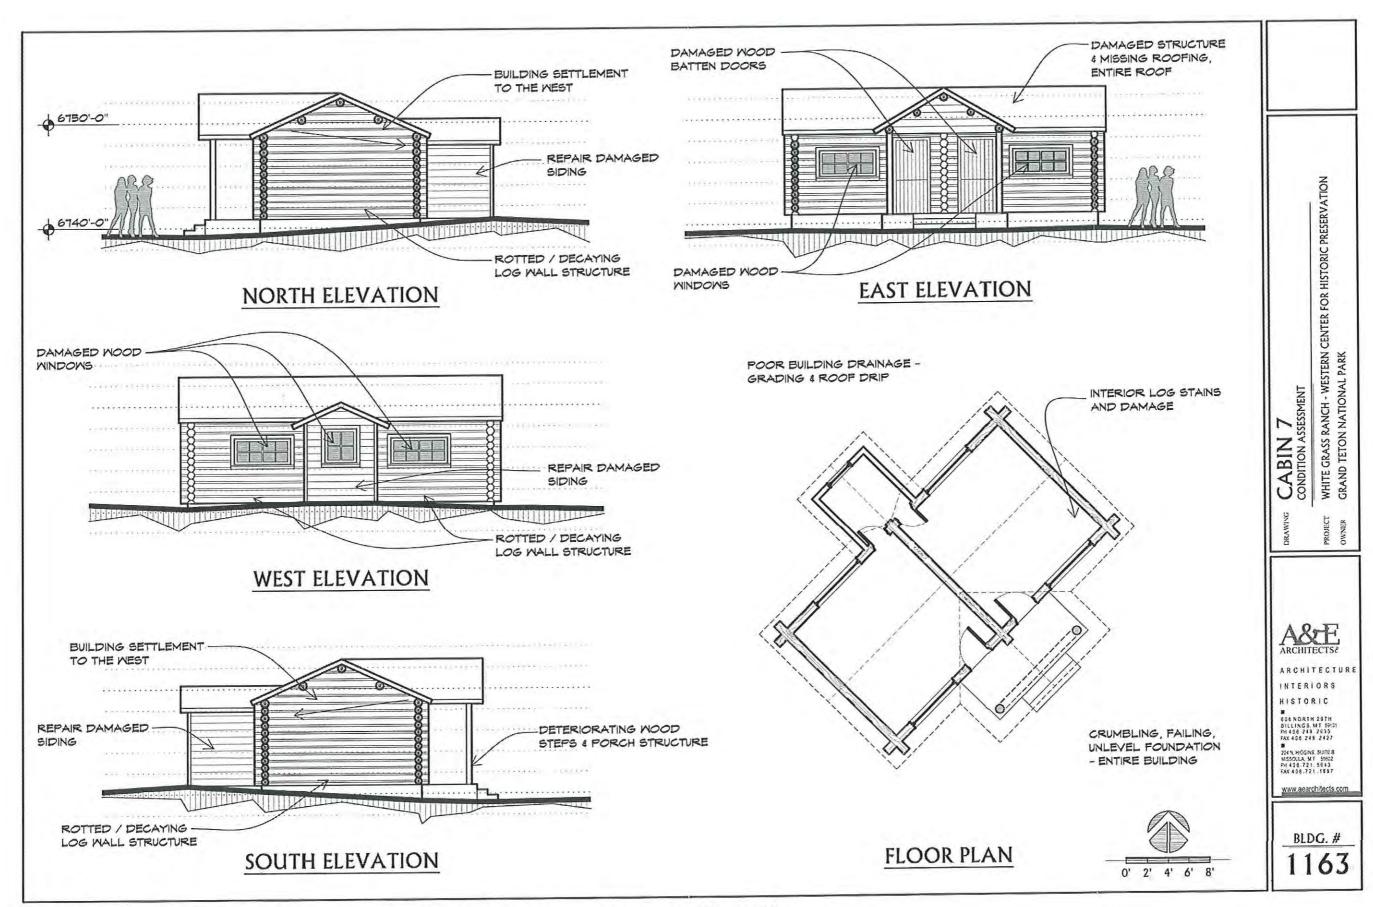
Existing conditions plan and elevations for HS-1163, Cabin 7, showing areas of deterioration (A&E: 2006).
